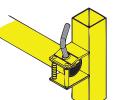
Shows the correct use of the LOBO System side clamp. You must ensure that the tube is level with the end of the side clamp or protruding at least through the side clamp. You must pay particular attention to ensure that the tube itself is level with the edge of the side clamp and not the end caps as this would mean that the tube itself is 5mm short of being flush with the edge.
